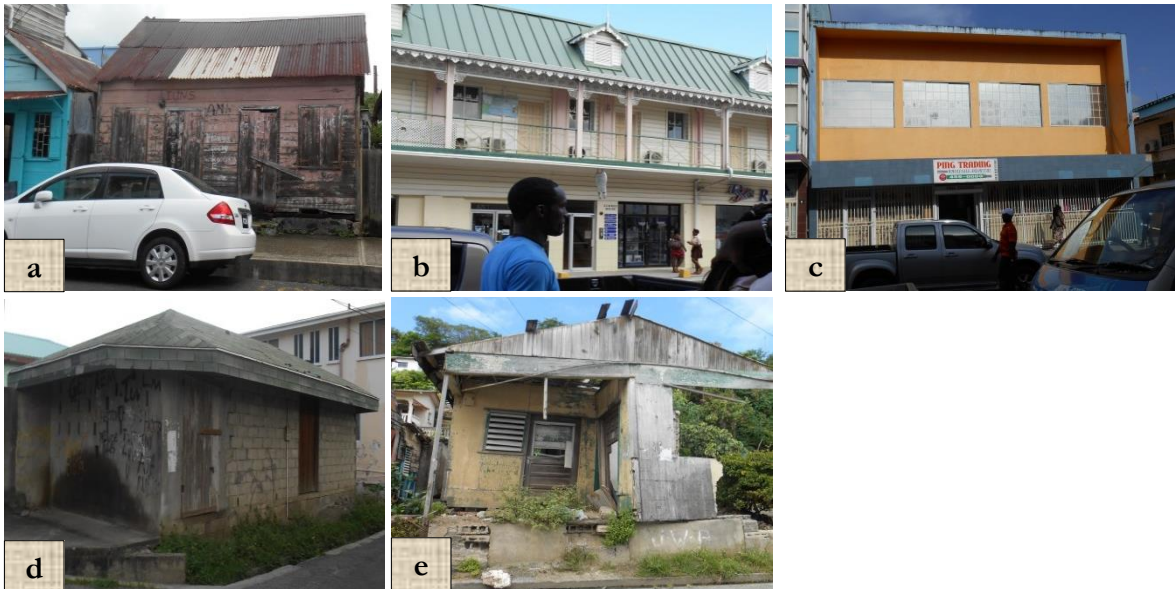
Types of roof (a) Galvanized Iron Sheet (b) Painted Steel Sheet (c) Concrete (d) Asphalt Shingles (e) No Roof
